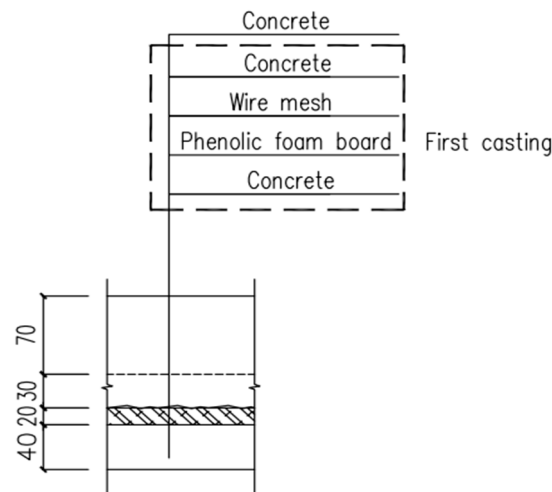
Schematic diagram of sandwich laminated floor slab interlayer structure.
